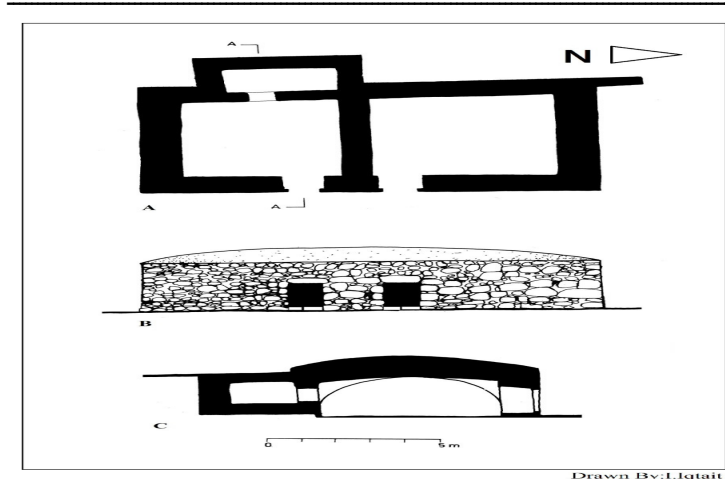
The second traditional building: a. Top-plan, b. eastern elevation, c. and sectional view (looking south).
